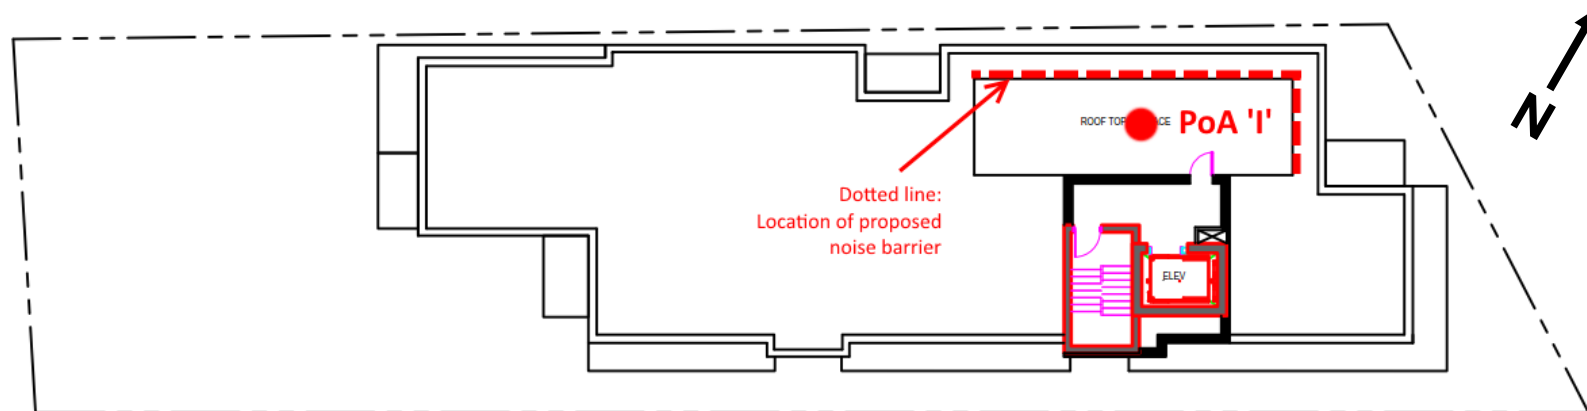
Site plan showing location of Point of Assessment PoA 'I' on the building rooftop.
